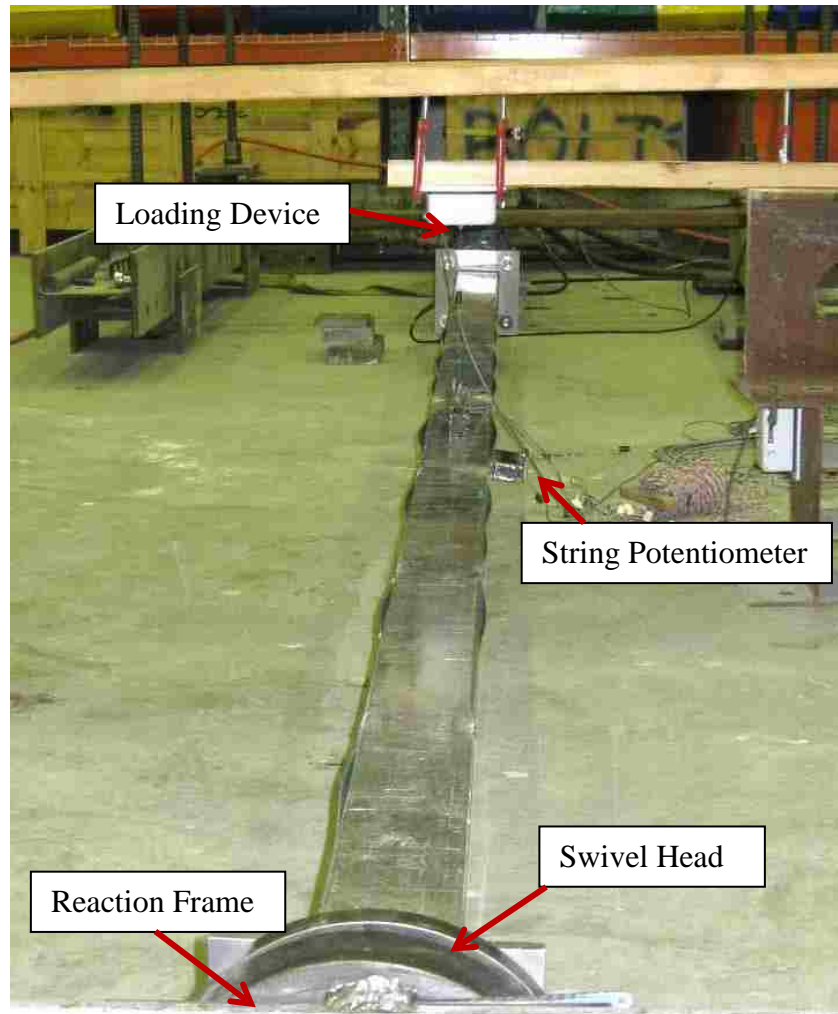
Photograph of “Adhesive and Welds” Column in Preliminary Testing to 20 kips Test Setup
